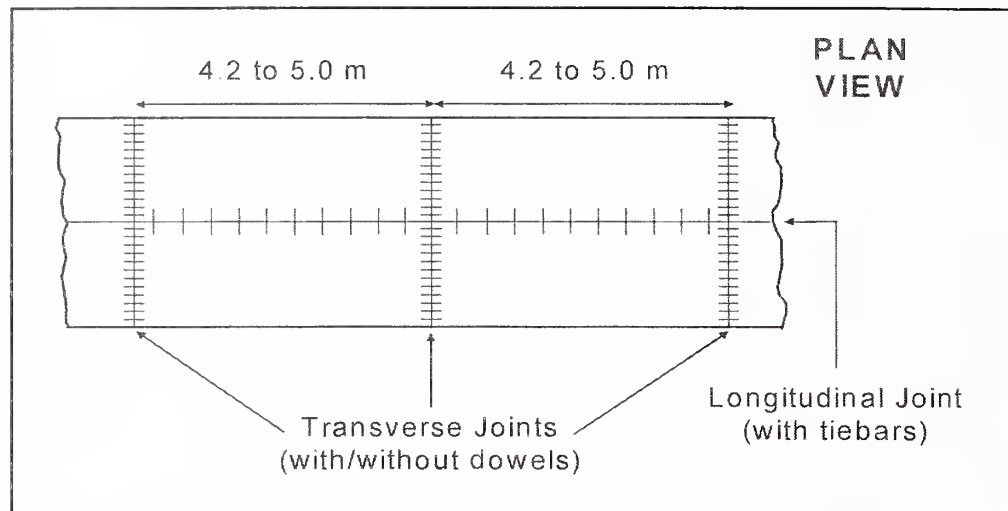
Jointed Plain Concrete Pavement (JPCP)
